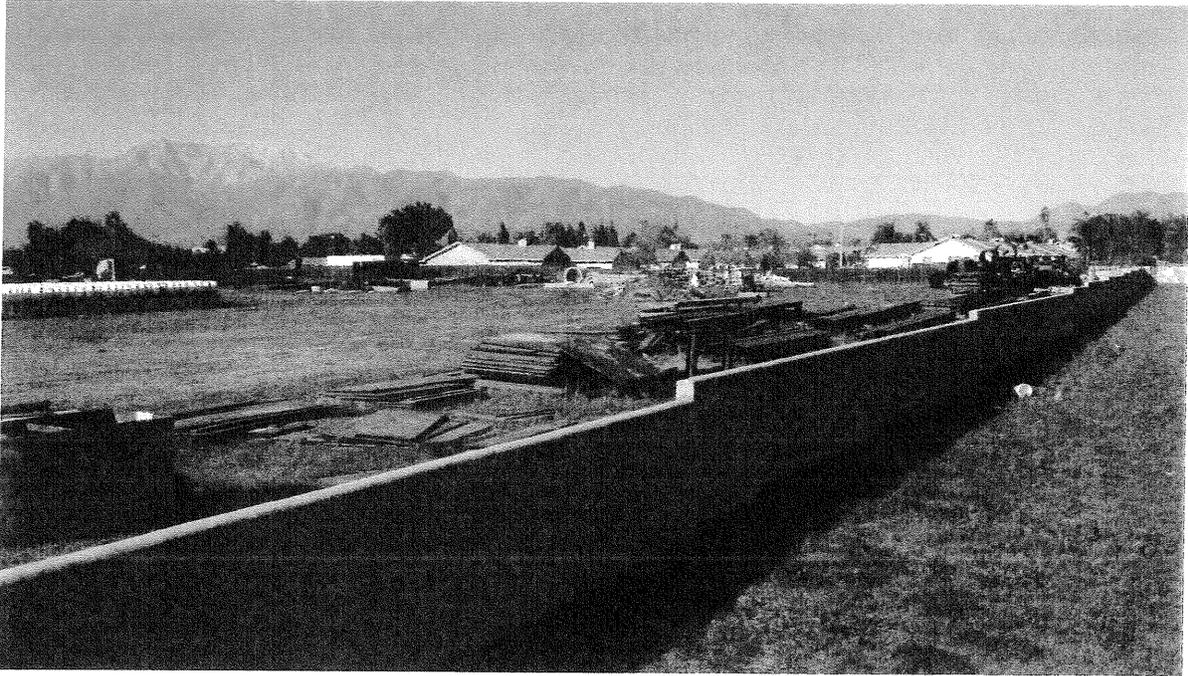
View of adjacent contractor's storage yard west of the subject site.
